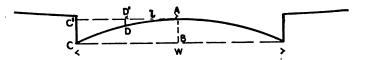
CROSS-SECTION OF PAVEMENT; GUTTERS AT SAME ELEVATION
